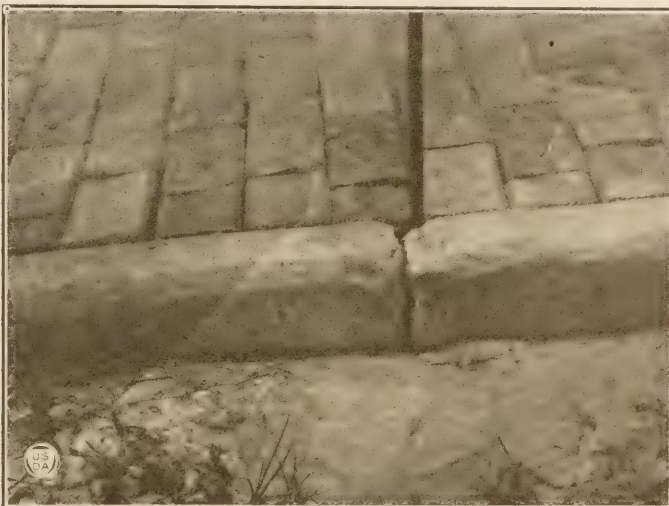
View showing absence of shoulder and wide, open curb joint on the Tildenville road.
